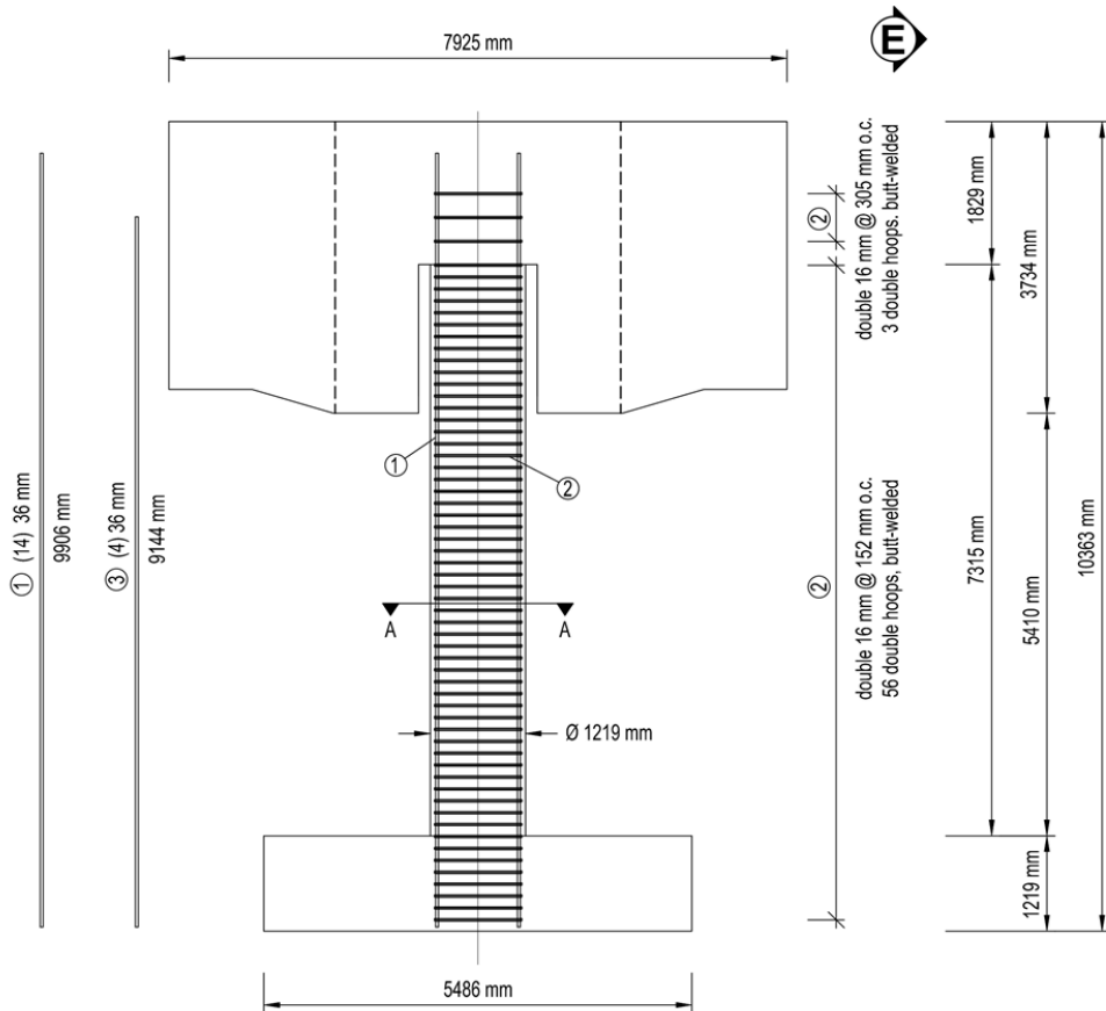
Large Bridge Column (L.B.C.) Test Specimen from Schoettler et al., Elevation View; Overall Dimensions and Reinforcement Layout
